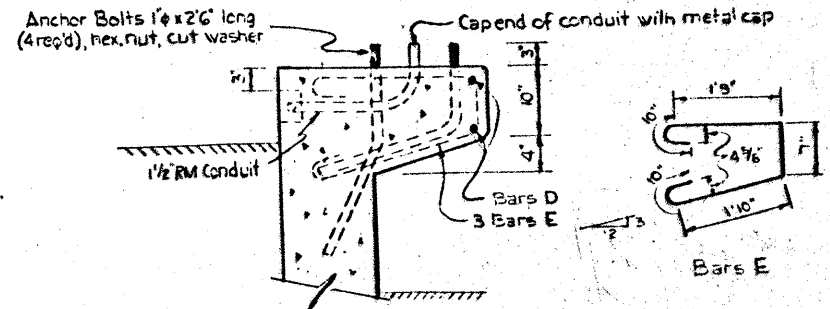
DETAIL OF EXISTING CONDUIT CONNECTION TO PULL BOX
